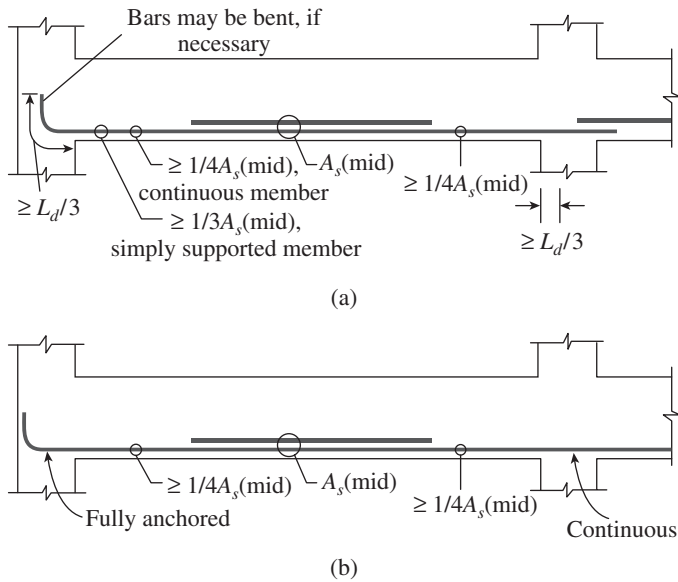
Positive moment reinforcement requirements (a) Beams that are not part of primary lateral load resisting system (b) Beams that are part of primary load resisting system
